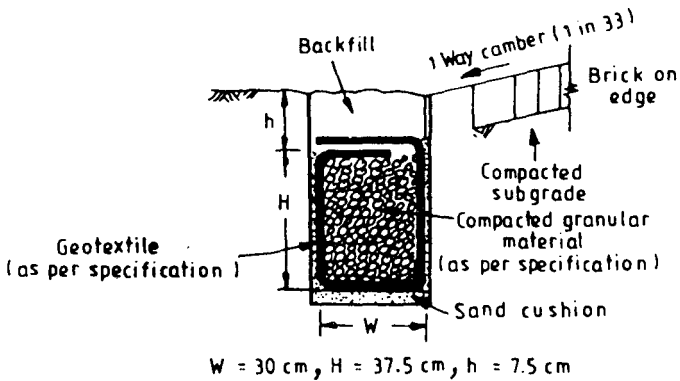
Typical geotextile-wrapped road edge drain for rural roads
